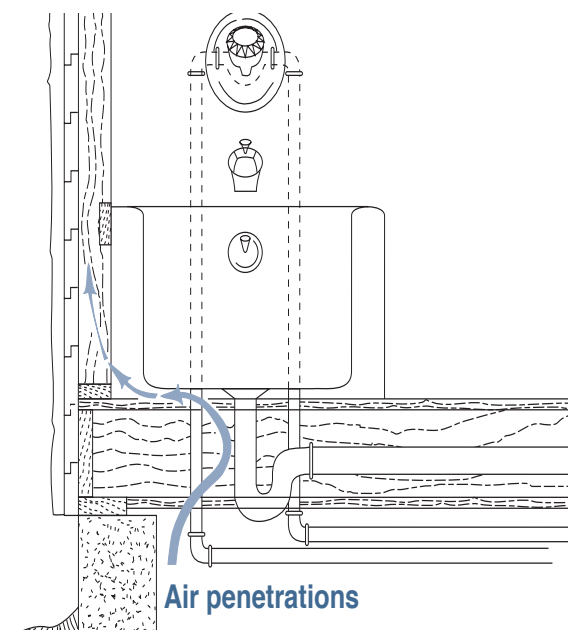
Block air movement up into bathtub openings with stiff cardboard or gypsum board, caulked and nailed to floor members.
